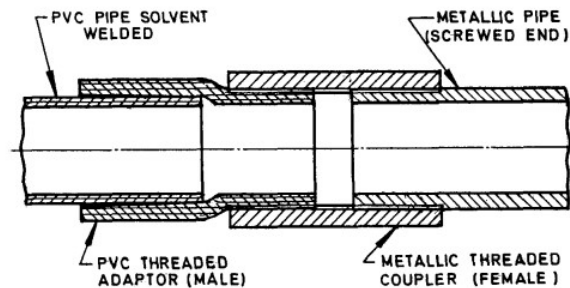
Jointing PVC Pipe to Conventional Pipe using Threaded Joints
